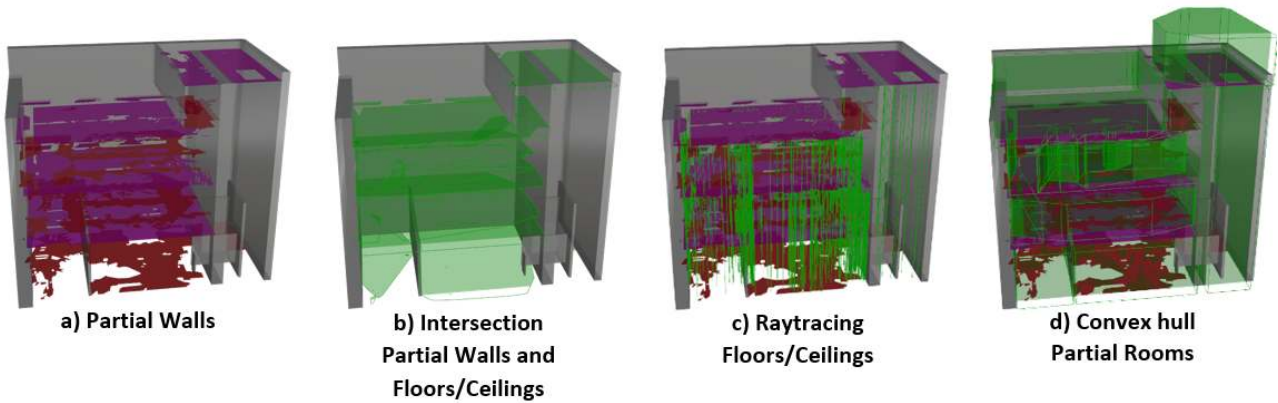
Overview workflow partial room reconstruction with partial walls in grey, floors in red and ceilings in purple: partial walls (a), adjusted floors/ceilings by intersection with partial walls (b), match between floors and overlaying ceilings trough ray-tracing (c) and convex hull of partial walls (d).
